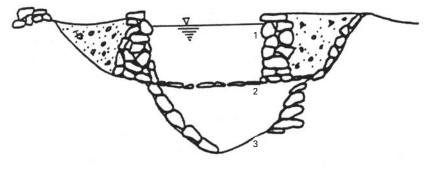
Pampa Huanchaco canal excavation revealing the cross section geom etry and stone lining.
